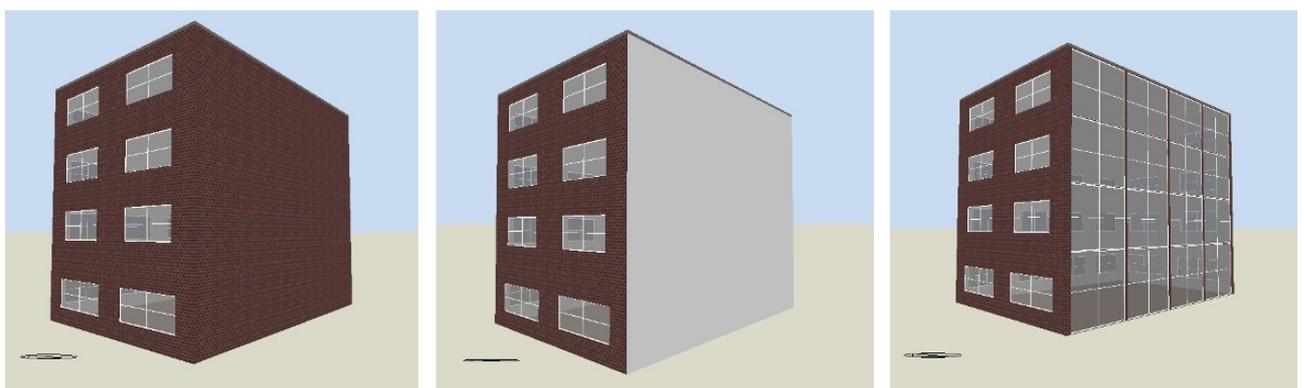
3D models for the conventional wall, ventilated façade and curtain wall economic studies
